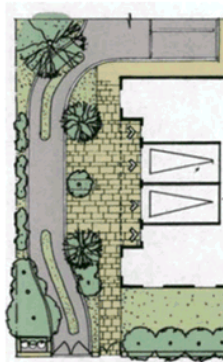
Curved pavement and landscape planting to reduce visual impact of driveway
